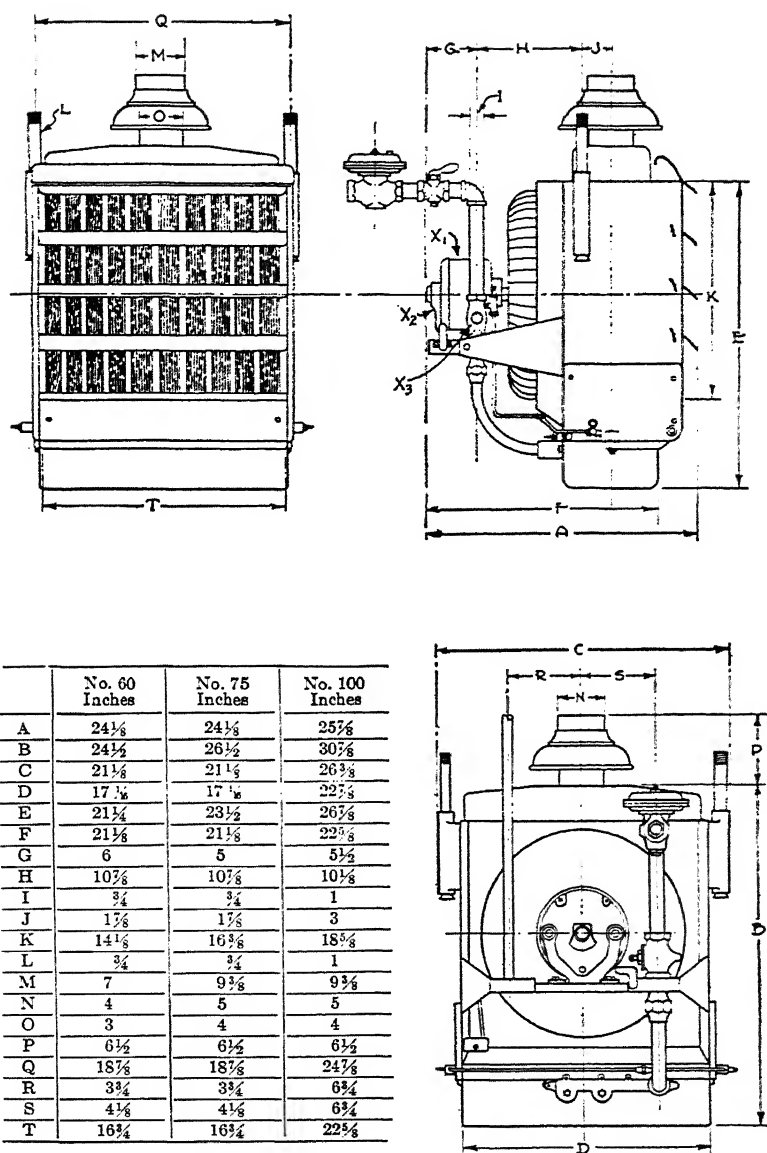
Typical Details and Dimensions for Gas Unit Heaters
